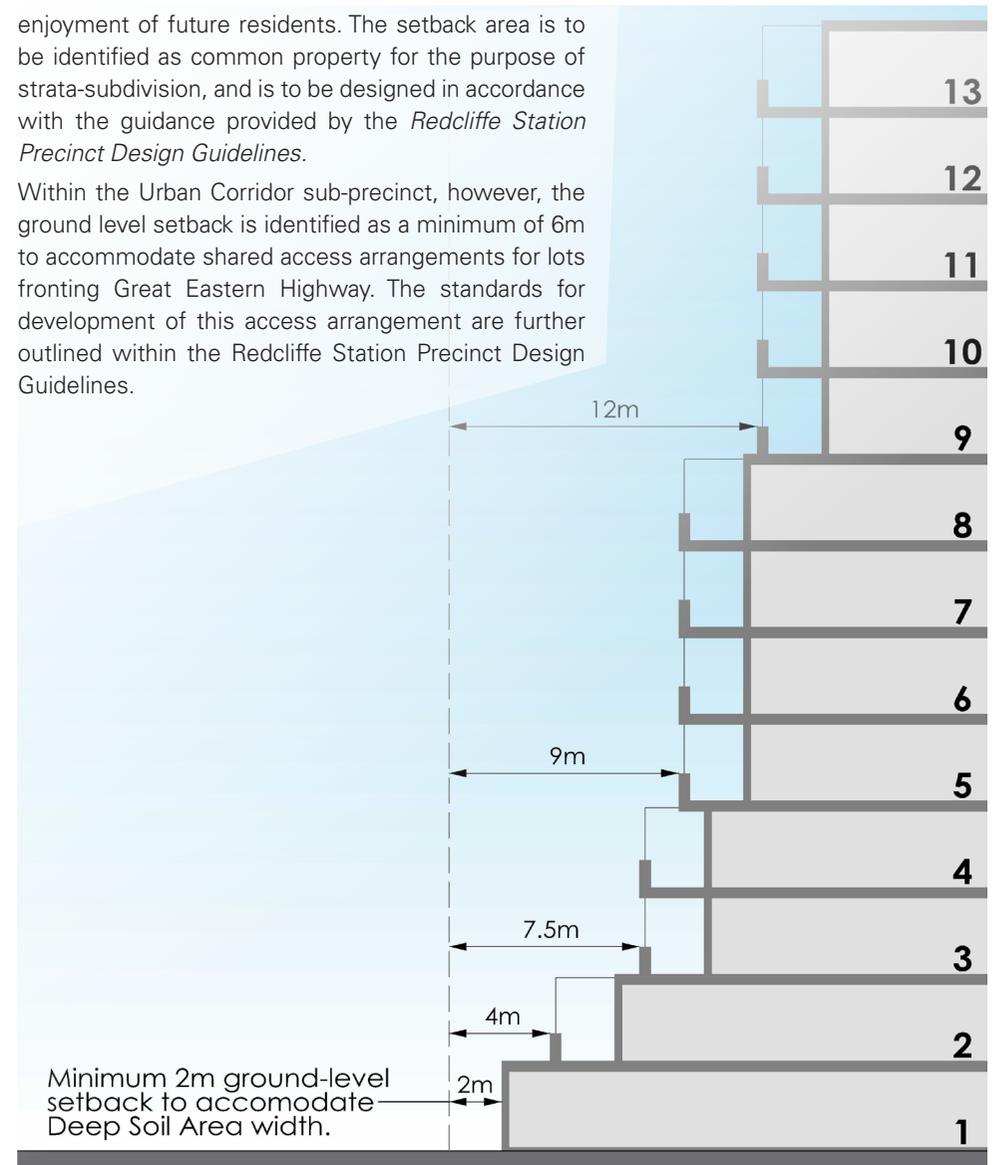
Proposed rear building setback arrangement based on building height and the requirement for deep soil zone at ground level for the majority of sub-precincts.
